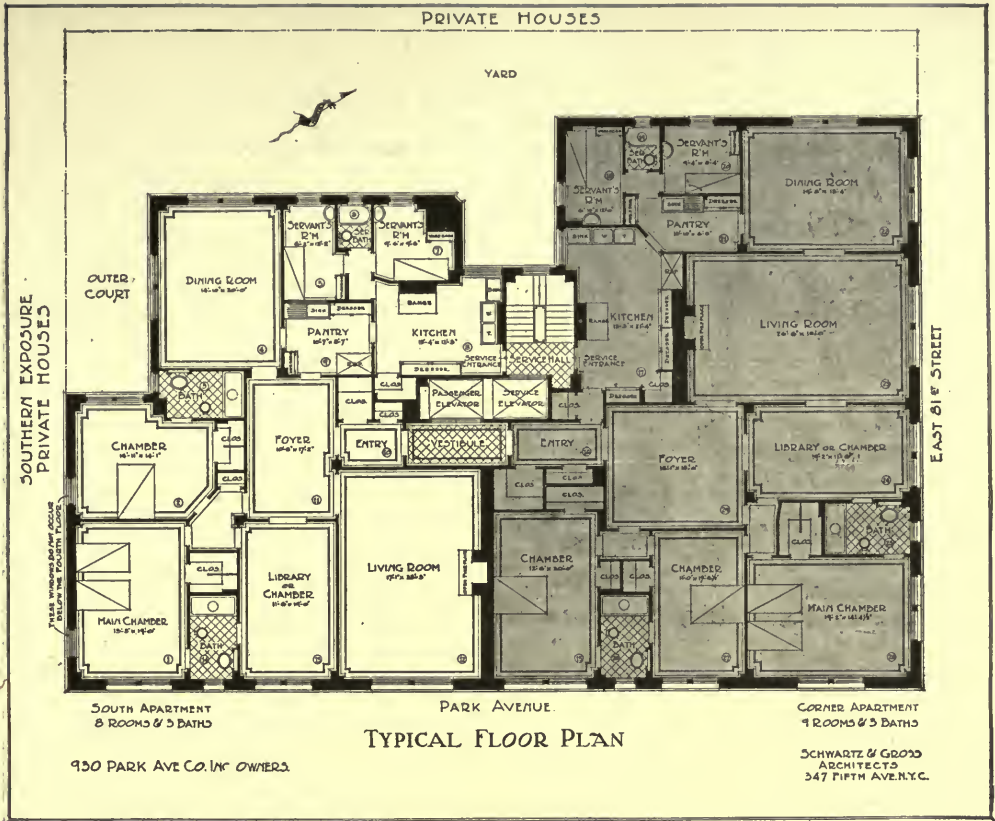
TYPICAL FLOOR PLANS—NO. 928 PARK AVENUE, SOUTHWEST CORNER OF 81ST STREET, NEW YORK CITY. Schwartz & Gross, Architects.
